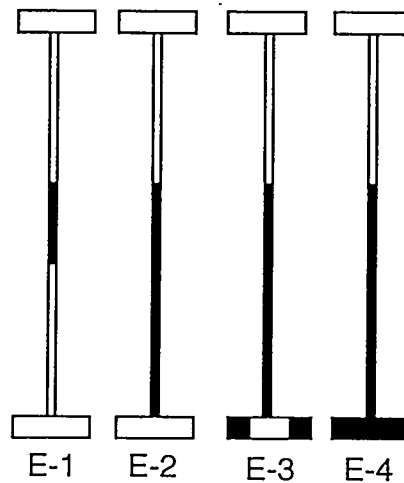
Portions of the north plate girder that were cut during the various damage scenarios.
